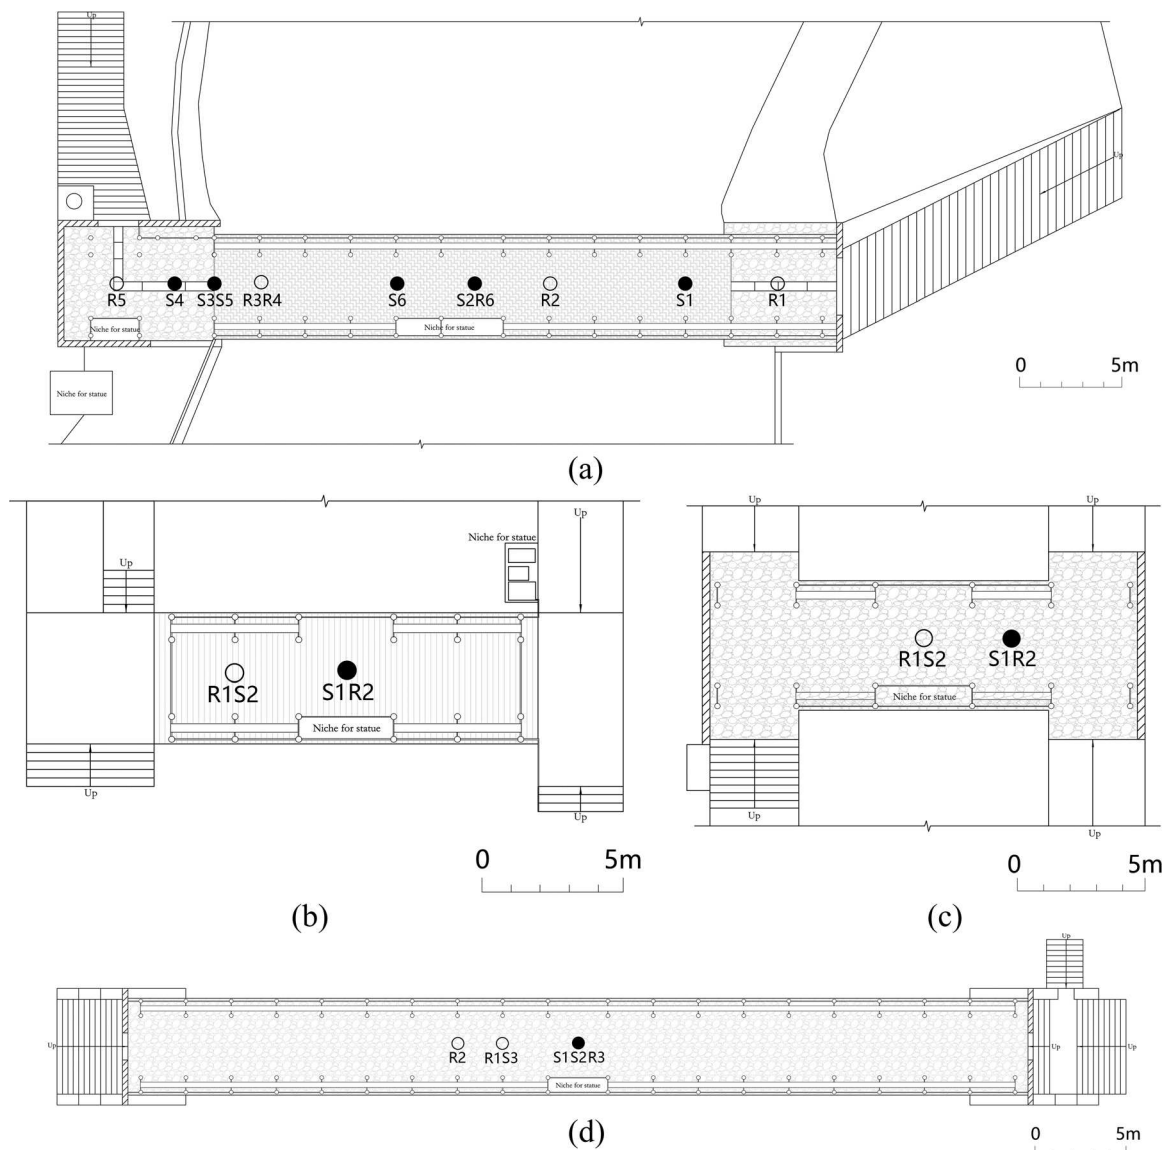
Plan views of the four CITAC bridges under study, showing the positions of the sound sources and acoustic receivers: (a) Denglong Bridge, (b) Shuangmen Bridge, (c) Futian Bridge, and (d) Lanxi Bridge.
